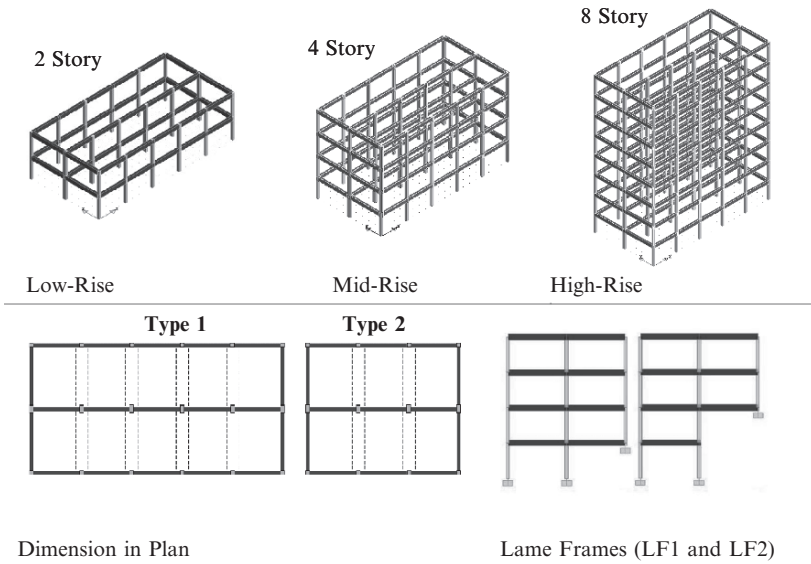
Number of story, plan dimensions and elevation irregularities considered in the building types under examination
